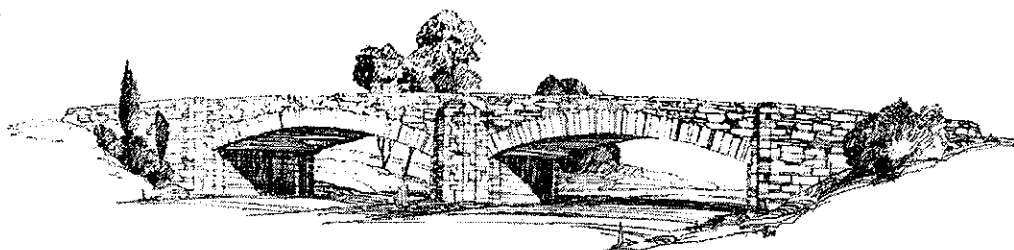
Architectural elevation of underpass at south end of Highway Bridge
